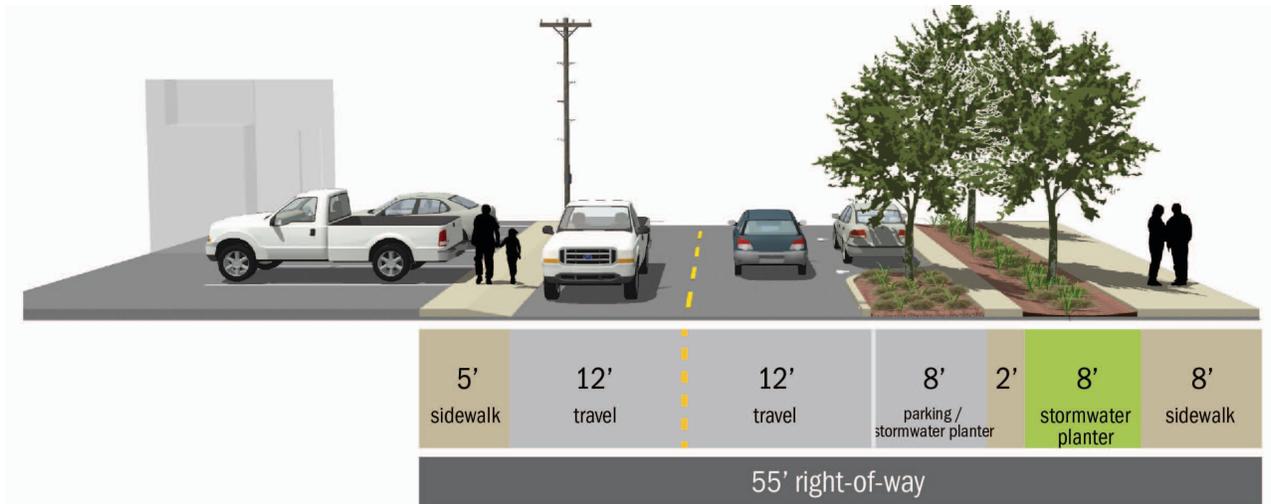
Conceptual Cross-Section for Stubb Street with continuous access
